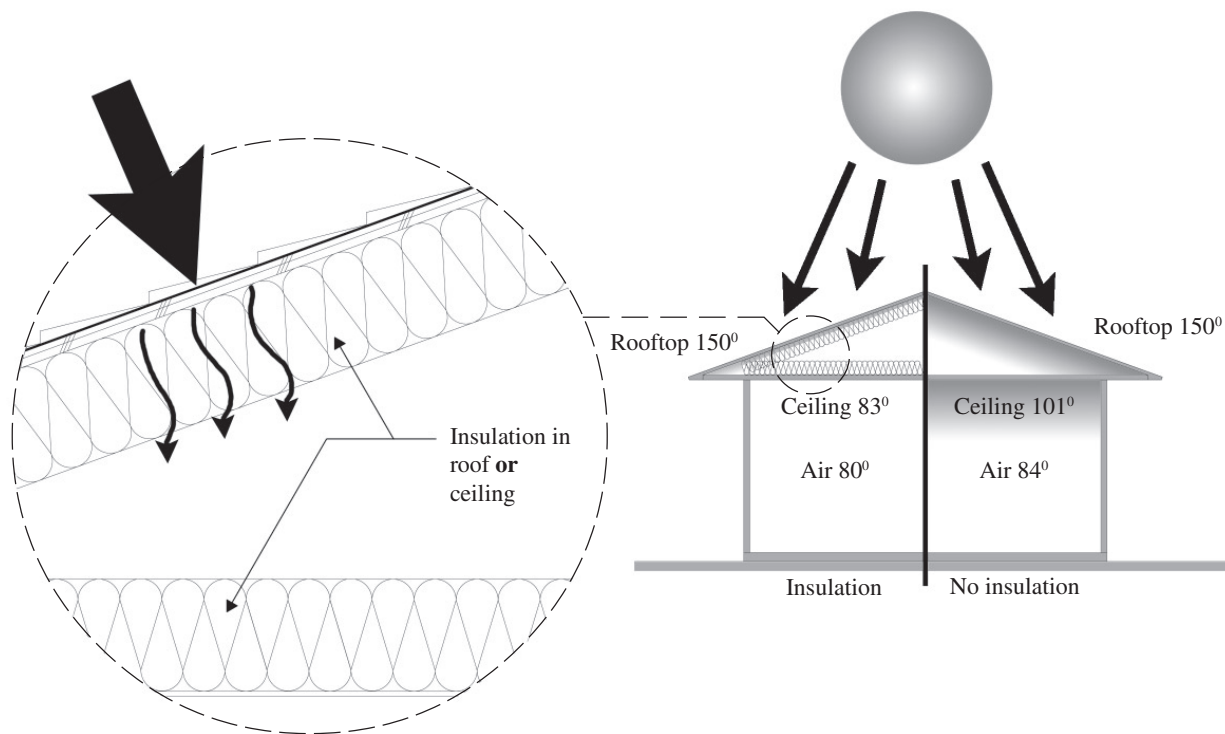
Insulate Ceilings to Reduce Heat Gain.
